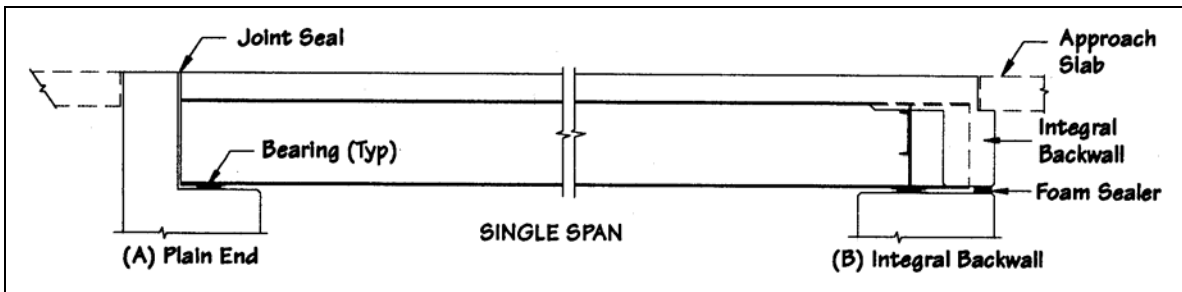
Typical single span Inverset Bridge (The Fort Miller Co., Inc., 1998)
